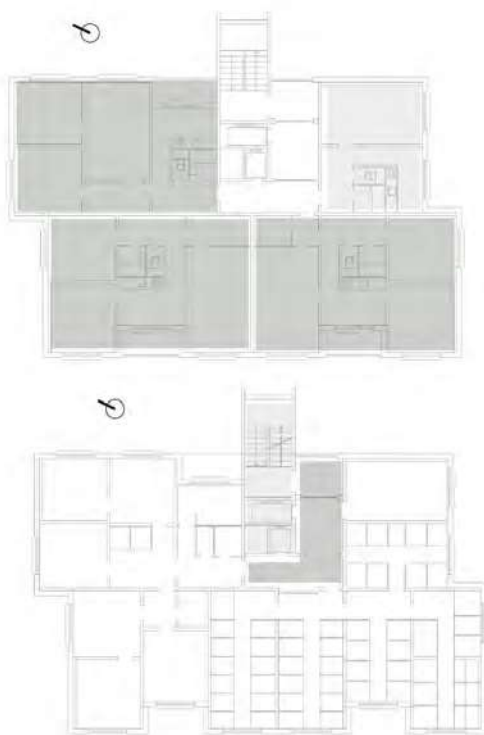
13-storey point panel apartment building of the ZTB-13B construction system - floor plan 2. - 13. floor, ground floor plan (Zdroj: authors)
